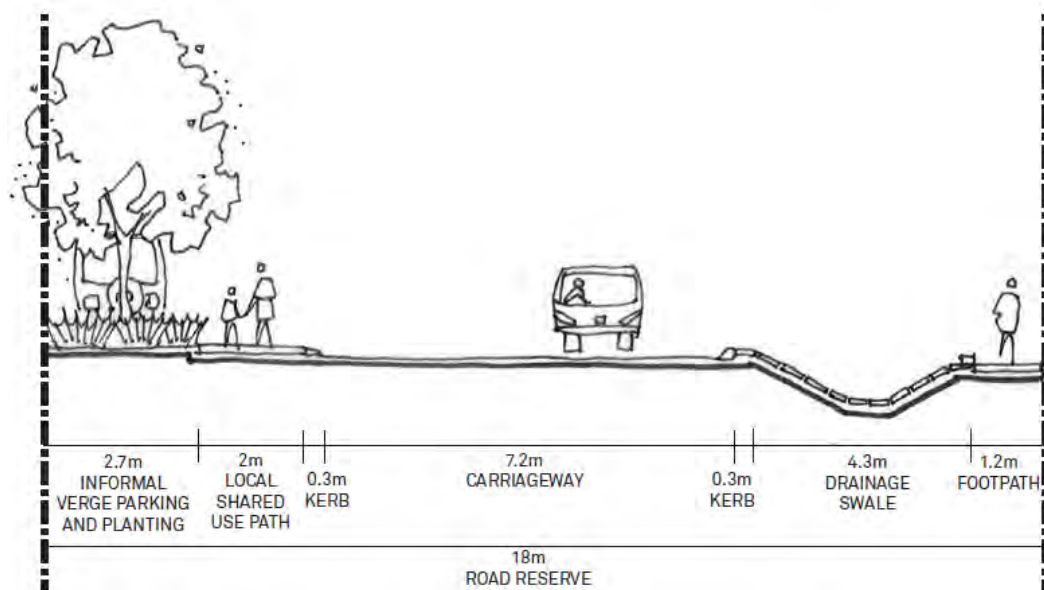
Road 1, 18 metre cross section west of Road 8 [Section (A)]
